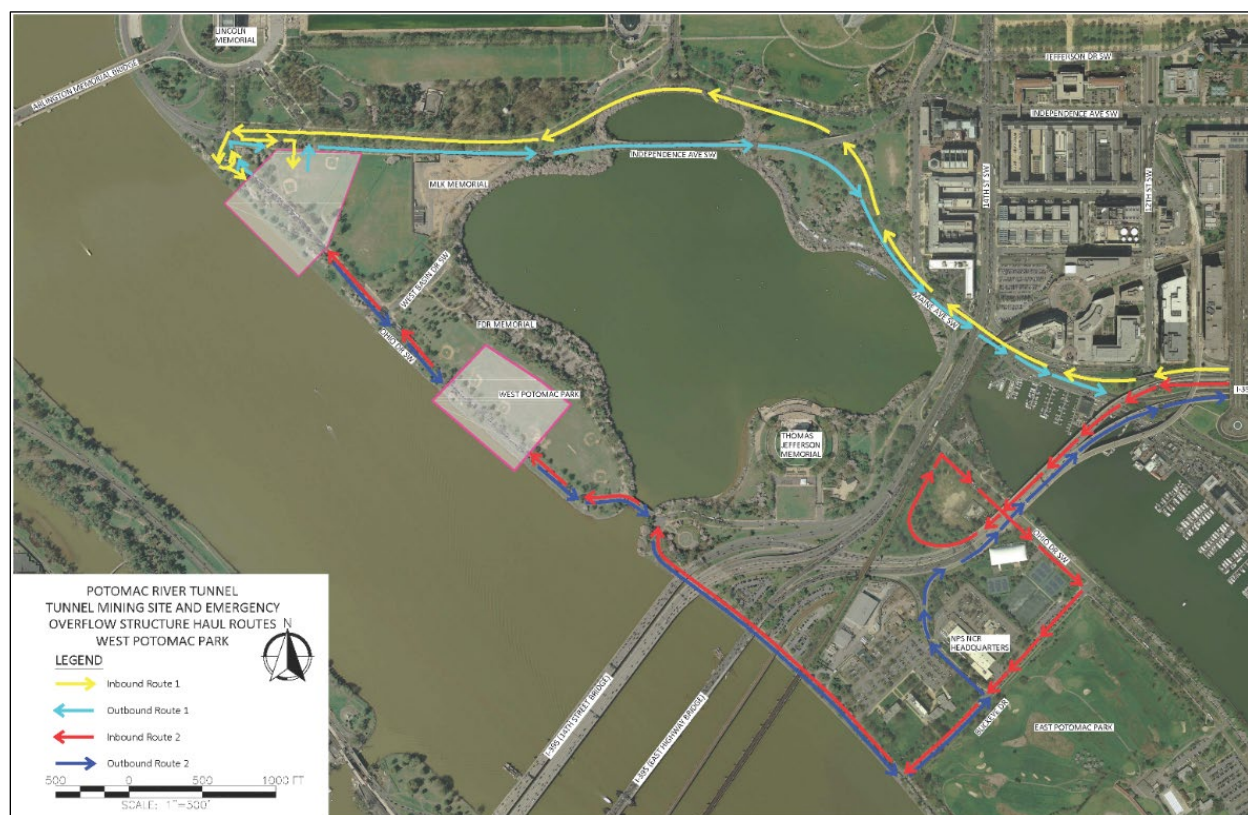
Haul Routes for West Potomac Park Tunnel Mining and Emergency Overflow Structure Sites
